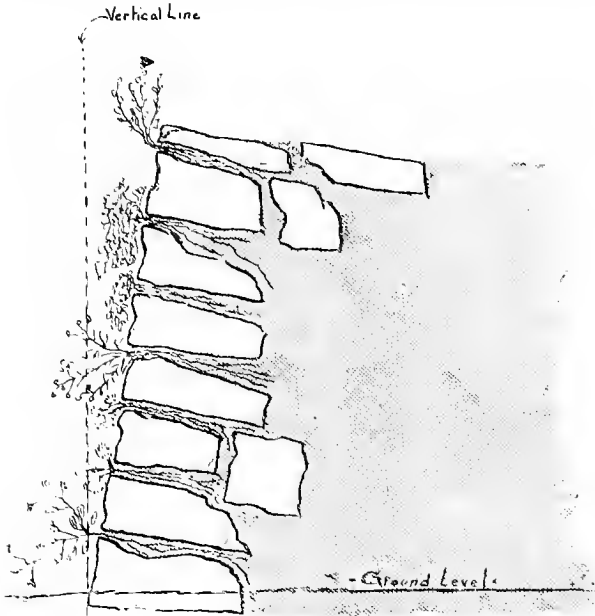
SECTION SHOWING THE PRINCIPLE OF ARRANGING STONES IN DRY WALLS.
